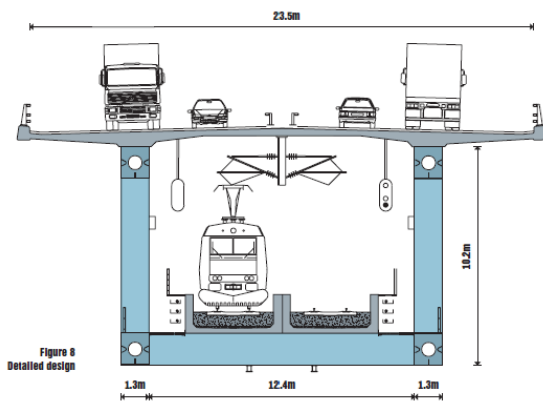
The Øresund Bridge, Denmark – Sweden [3]
